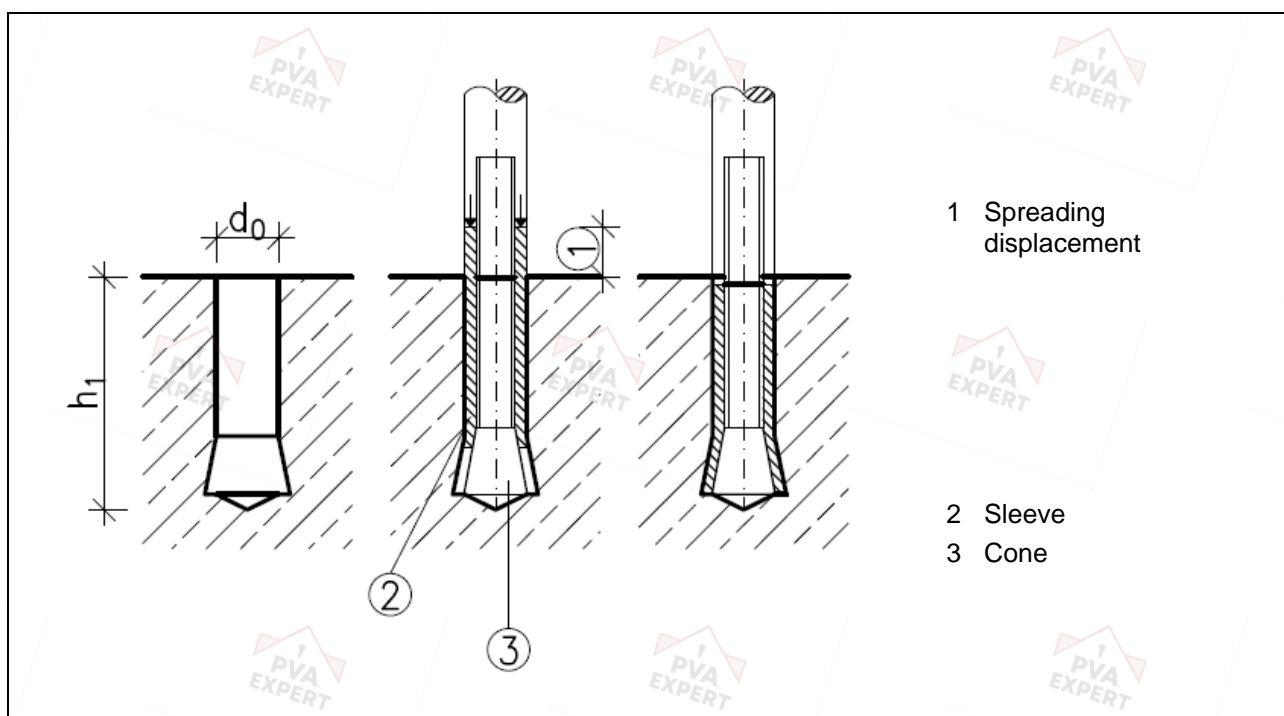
Fastener installation by hammering the fastener sleeve onto the cone
